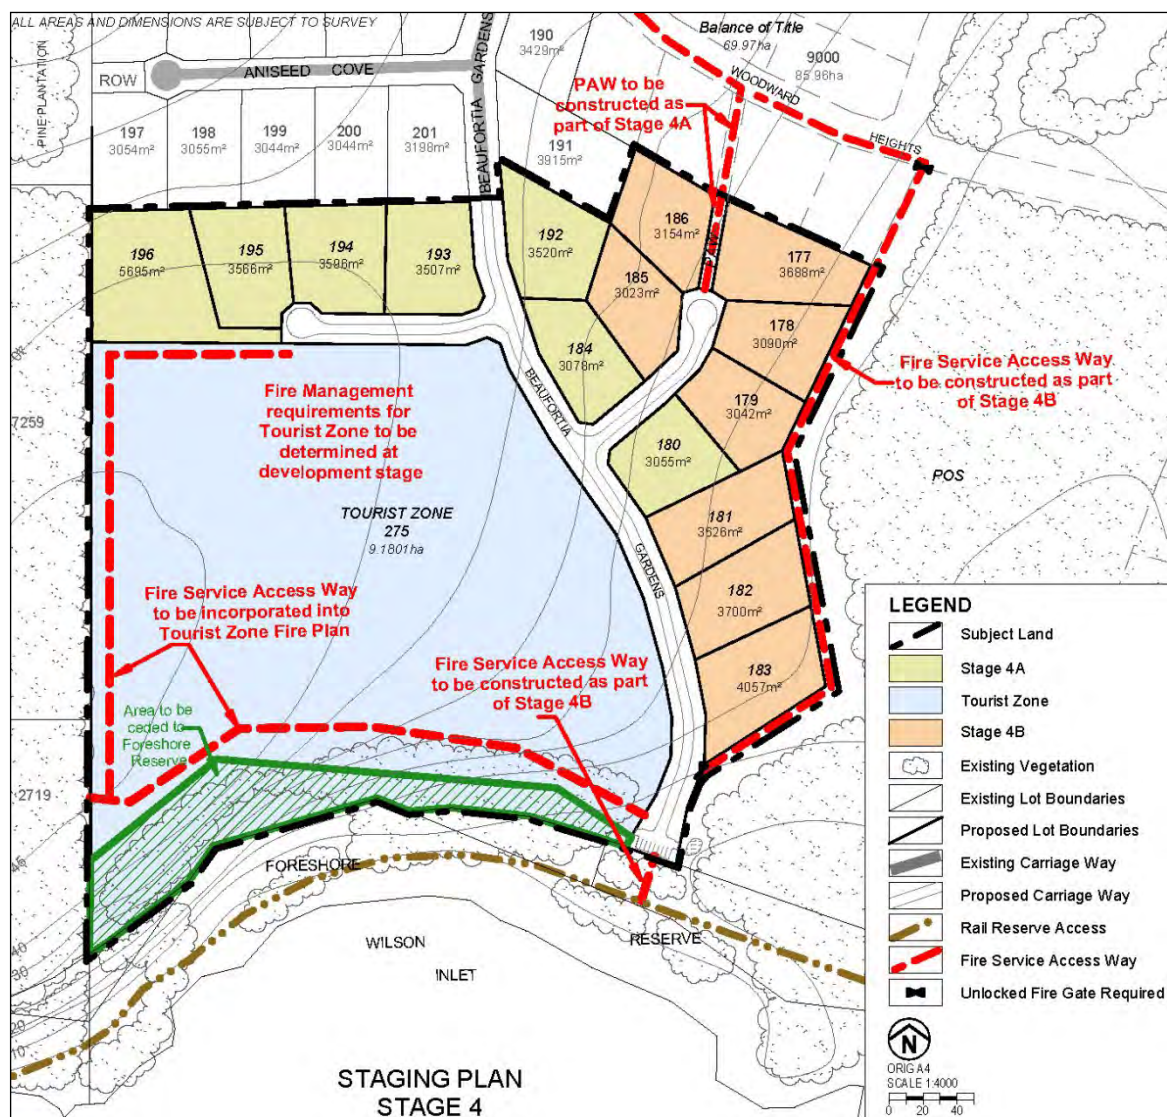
Stage 4 Staging Plan – Fire Management Plan
